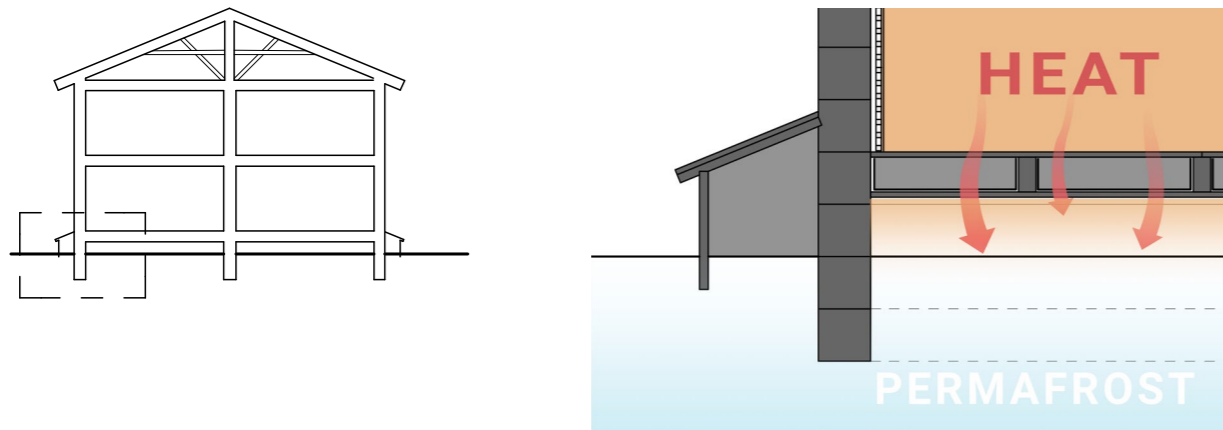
(on the left): A scheme shows the positive effect of raised foundation. The air gap works as a barrier for the building heat, protecting permafrost from thawing. In real conditions, however, due to the overuse of heating system, this air gap was not enough to prevent permafrost degradation.
